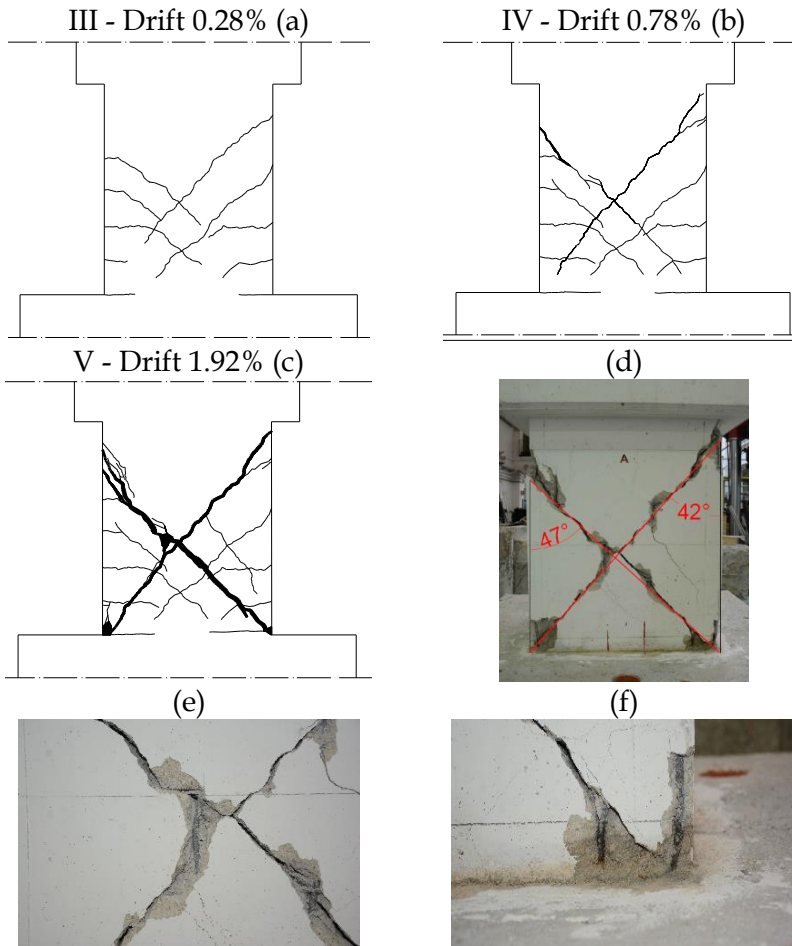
Test P3 evolution of damage (a) – (f), final damage state (g), corner bar fracture (h)
